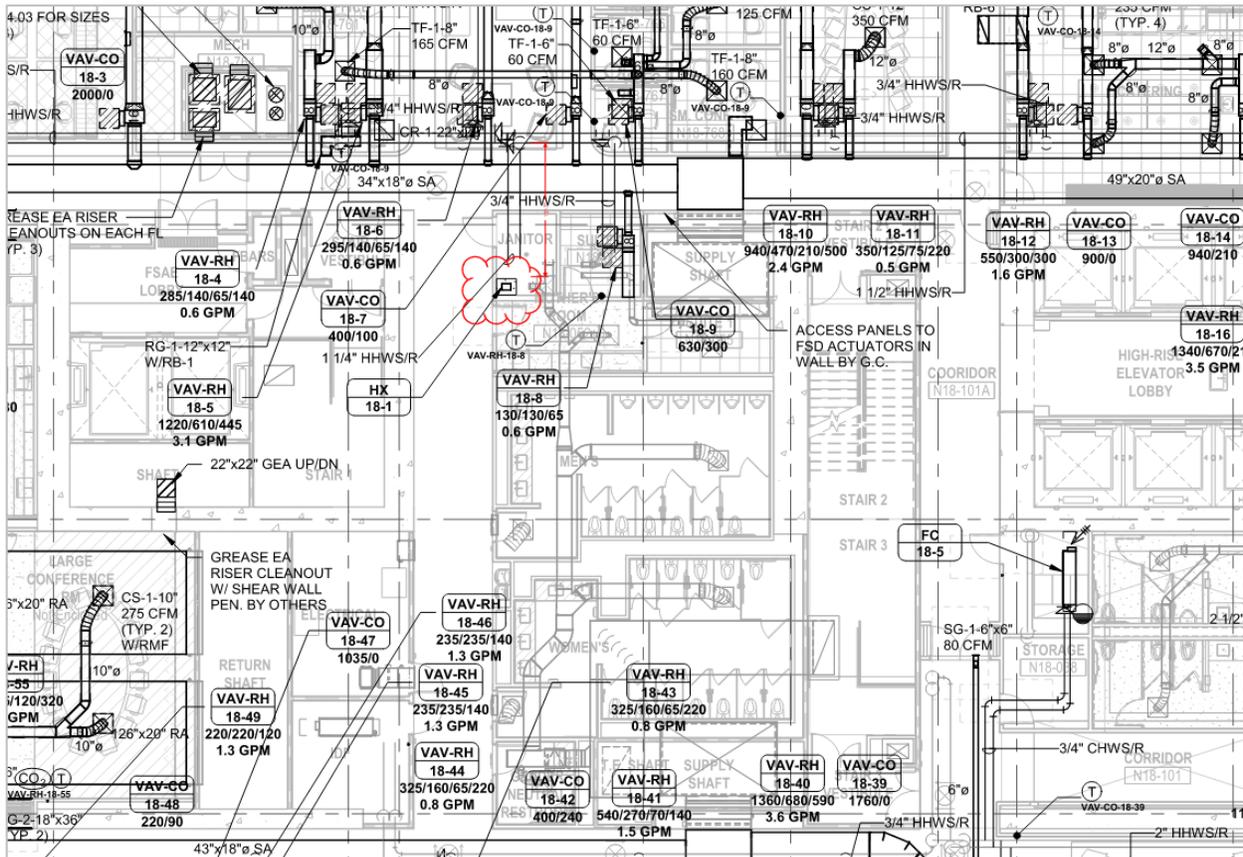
San Jose Building "A" Mechanical Drawing Level 18
